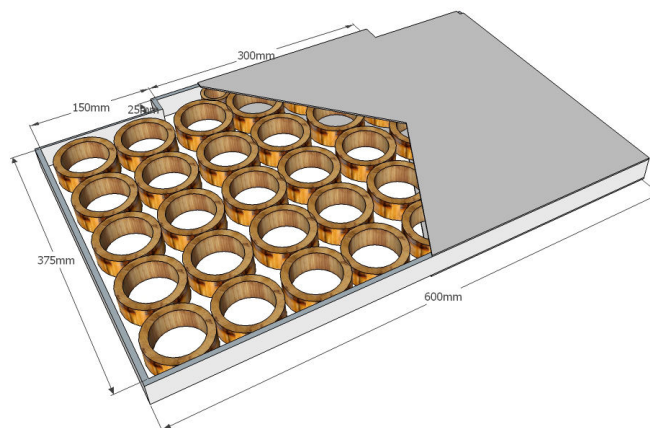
Panel Units Used in the Construction of Bamboo Insulation Layer
